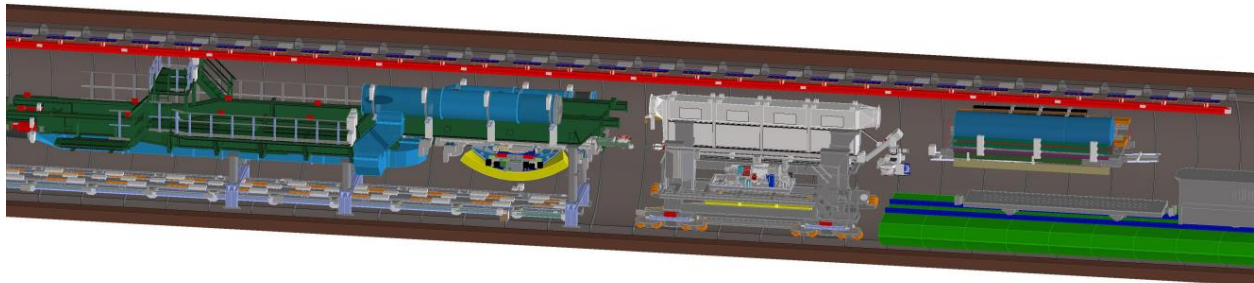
Disassembly gantry 1 ("HK 5102-091-001-01 Shield Disassembly", Herrenknecht, 2022)
